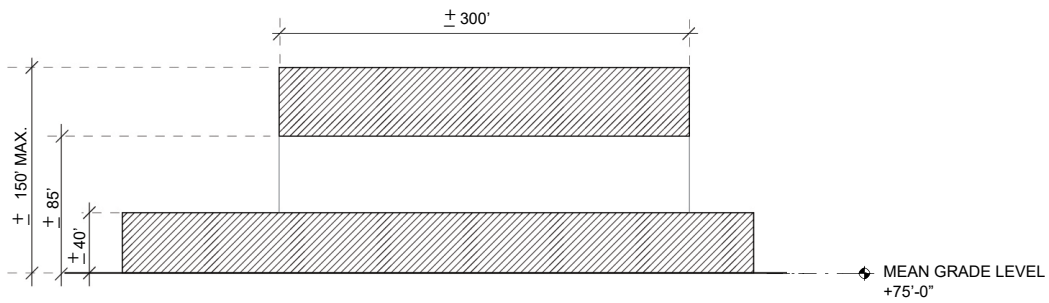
BUILDING SIGNAGE - HOTEL, NORTH AND EAST
